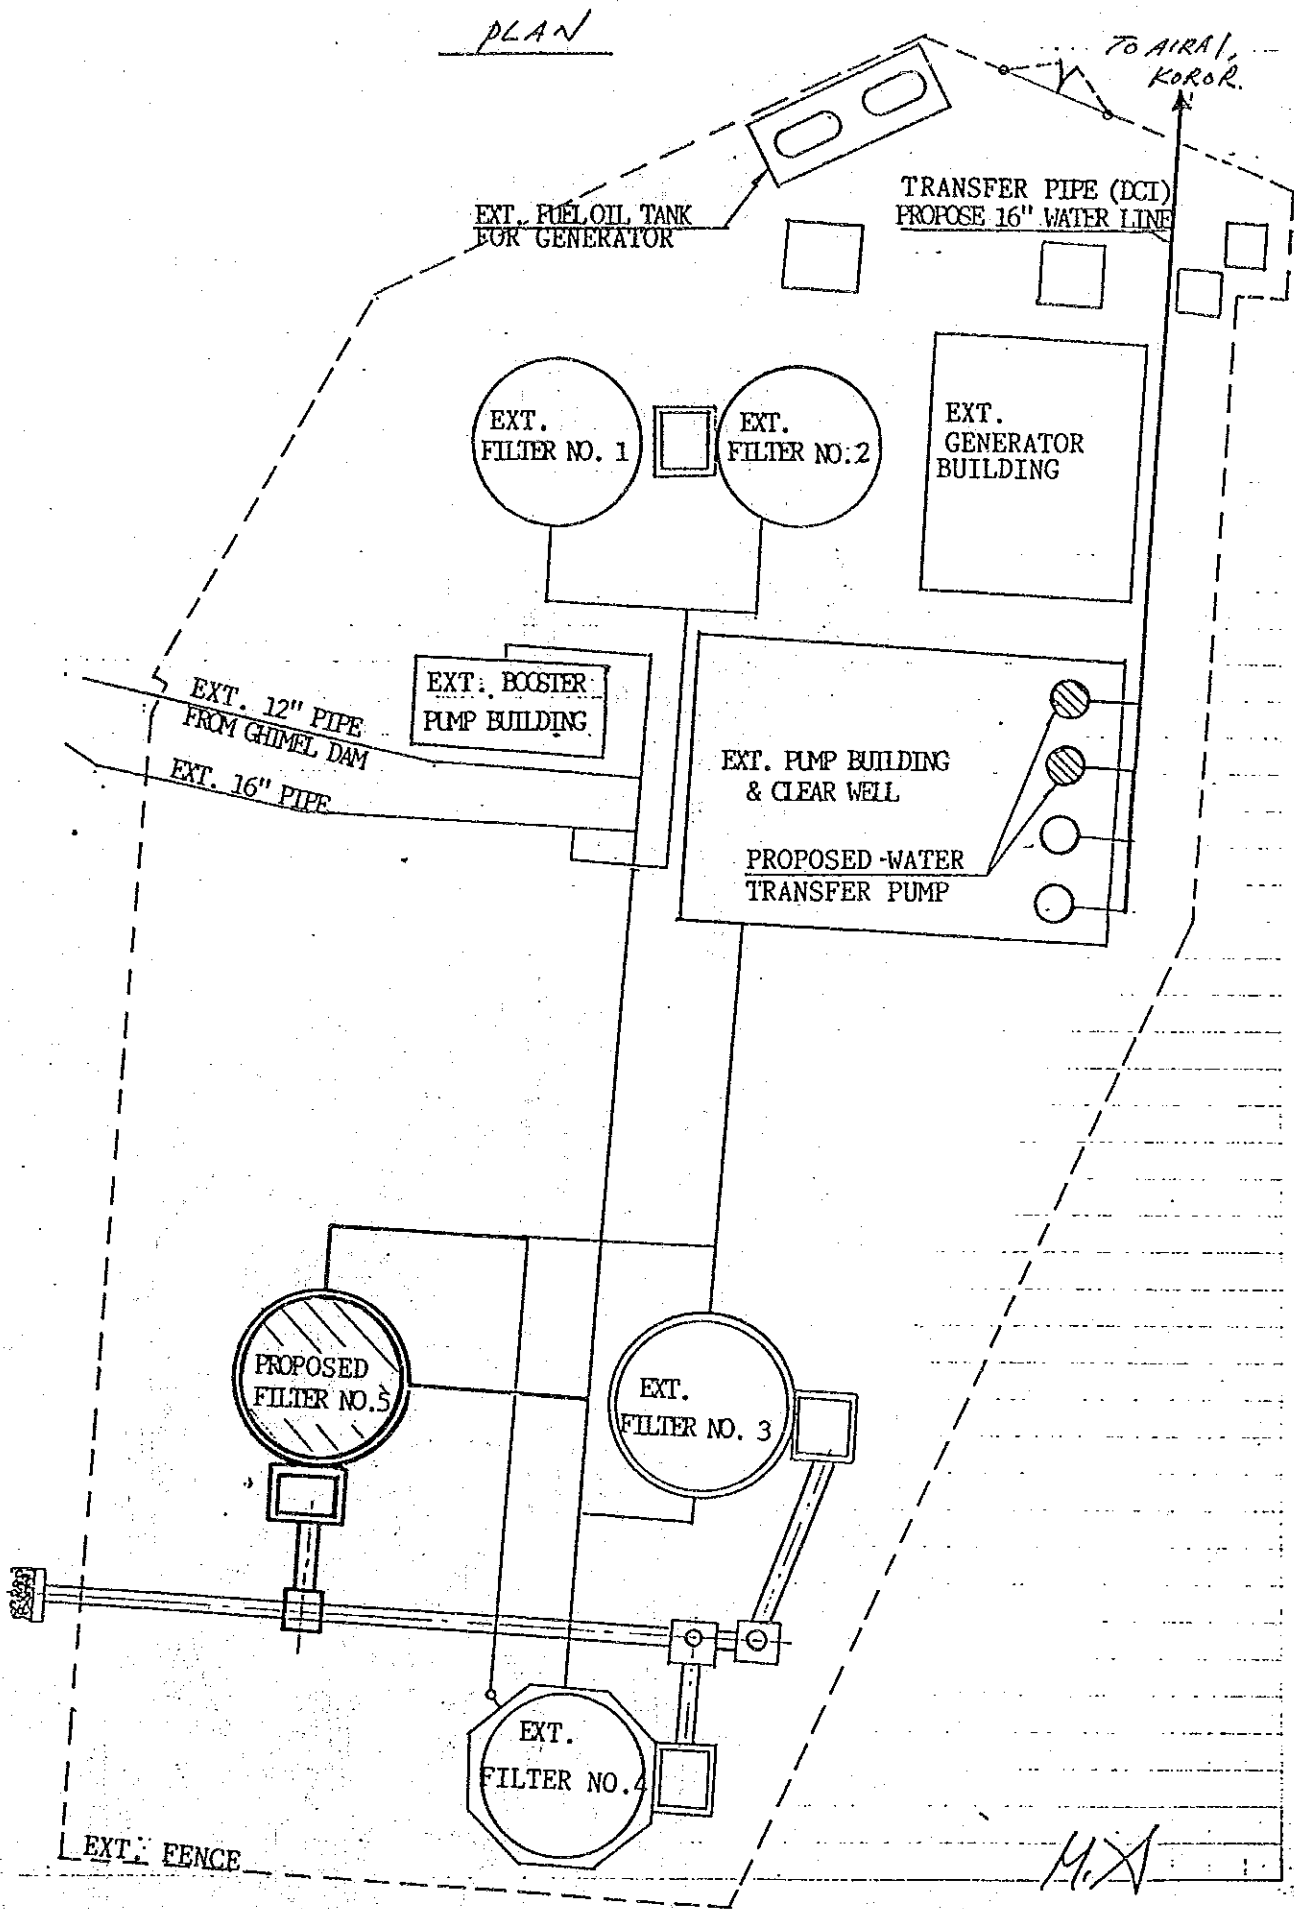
PLAN FOR PROPOSED FILTER NO. 5
